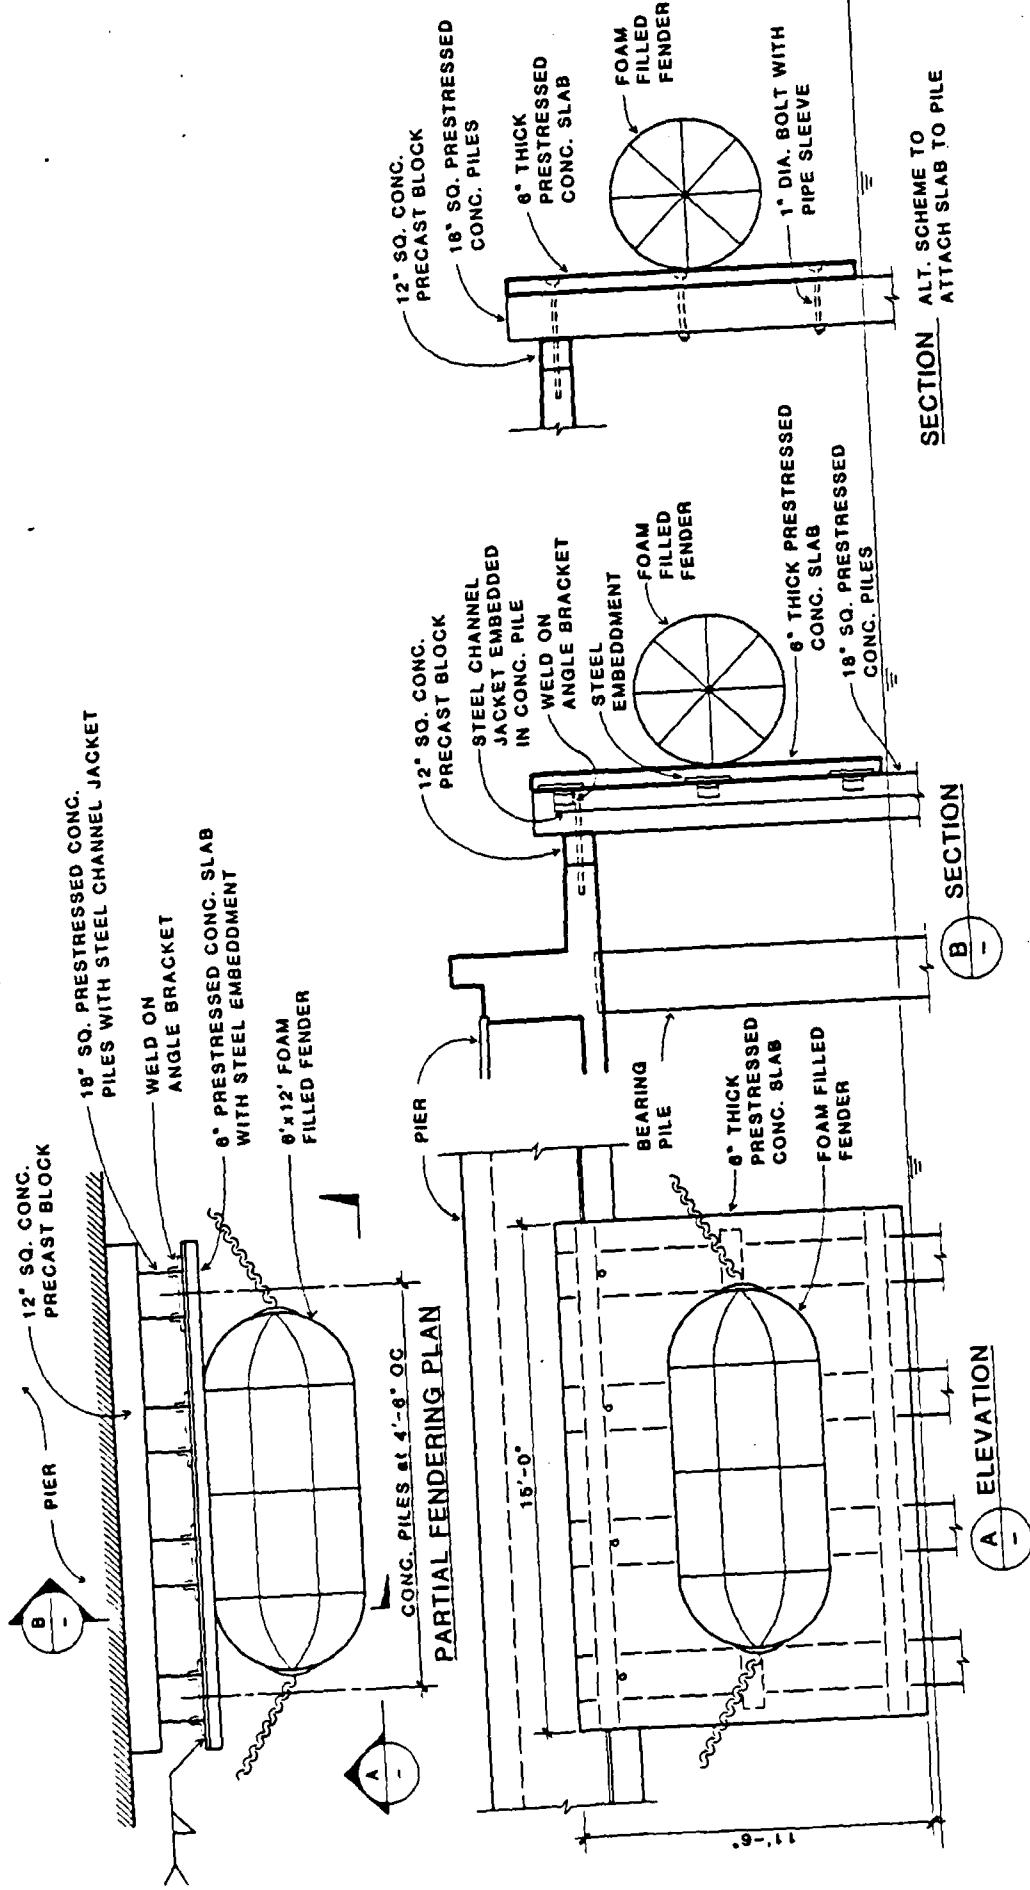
Concrete Fender System Using Concrete Bearing Panel
